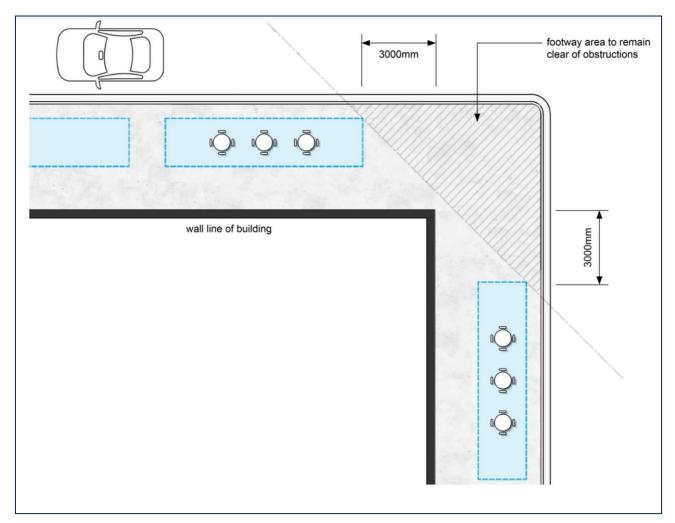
Outdoor dining requirements at corner sites/intersections
